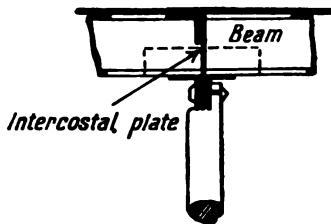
Another excellent method of supporting Steel Decks in conjunction with Pillars.
